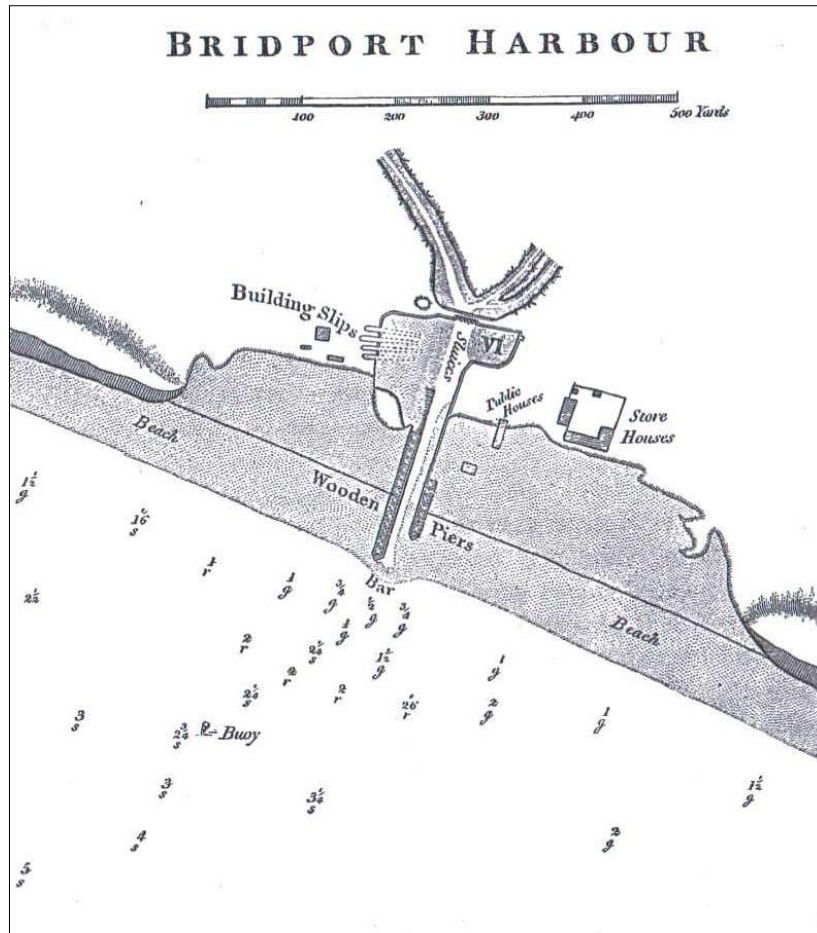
, Plan of the piers at Bridport 1787 (from Symonds 1912)
